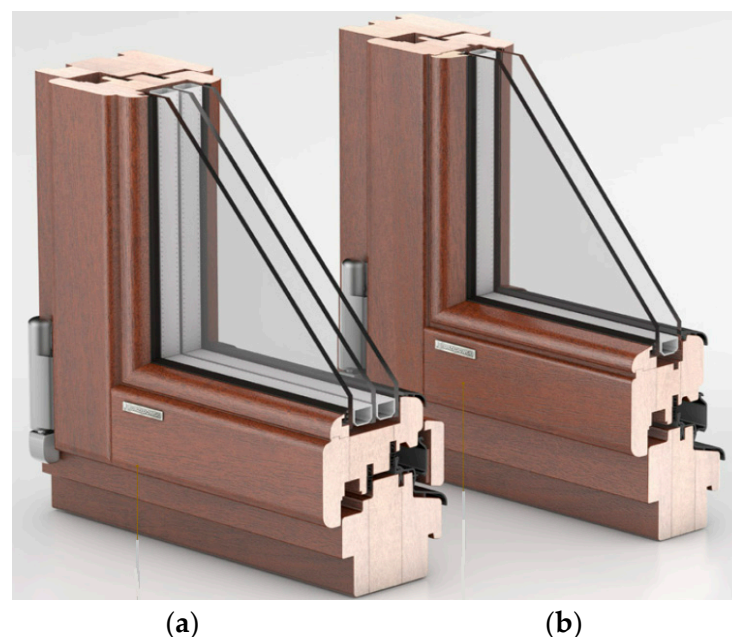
Cross-section of a window with a wooden structure: (a) triple-glazed (b) double-glazed.
